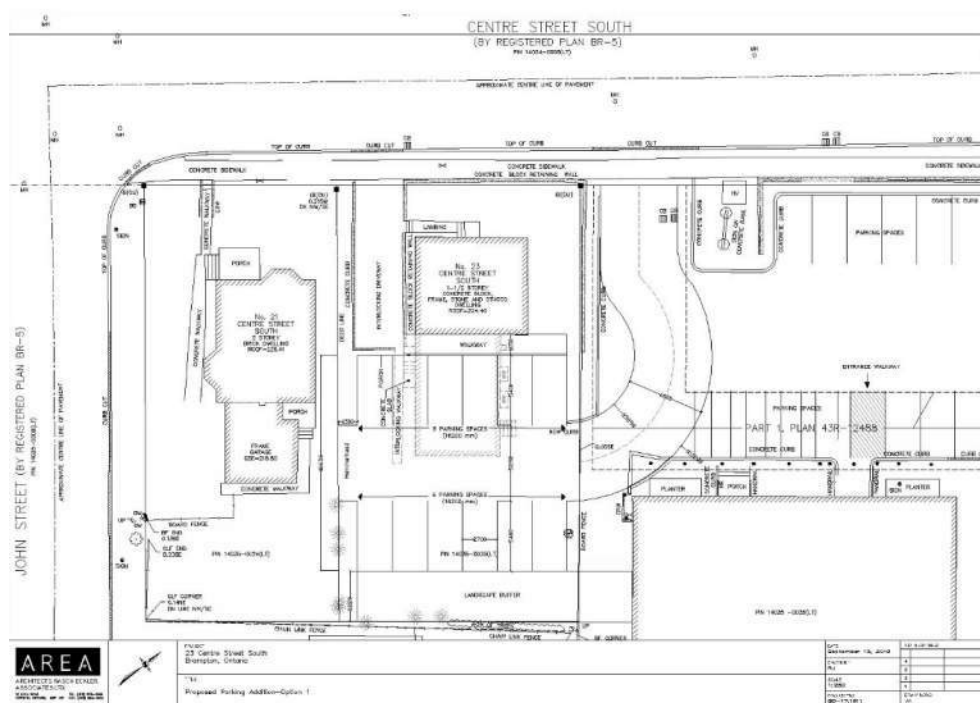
Option 1: Site Plan Drawing with proposed demolition of rear wing and additional parking
